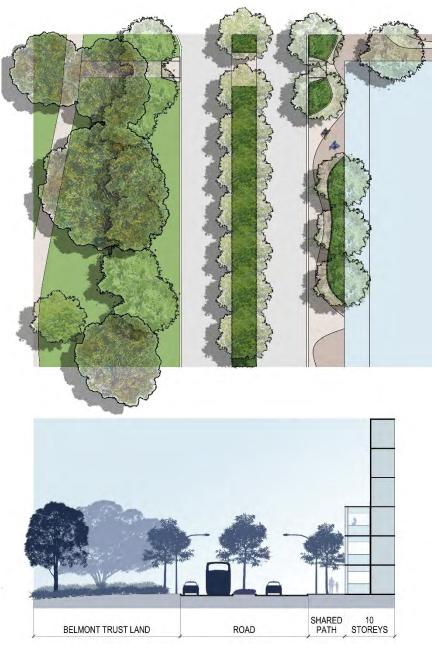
Stoneham Street (Plan Extract and Indicative Section)
